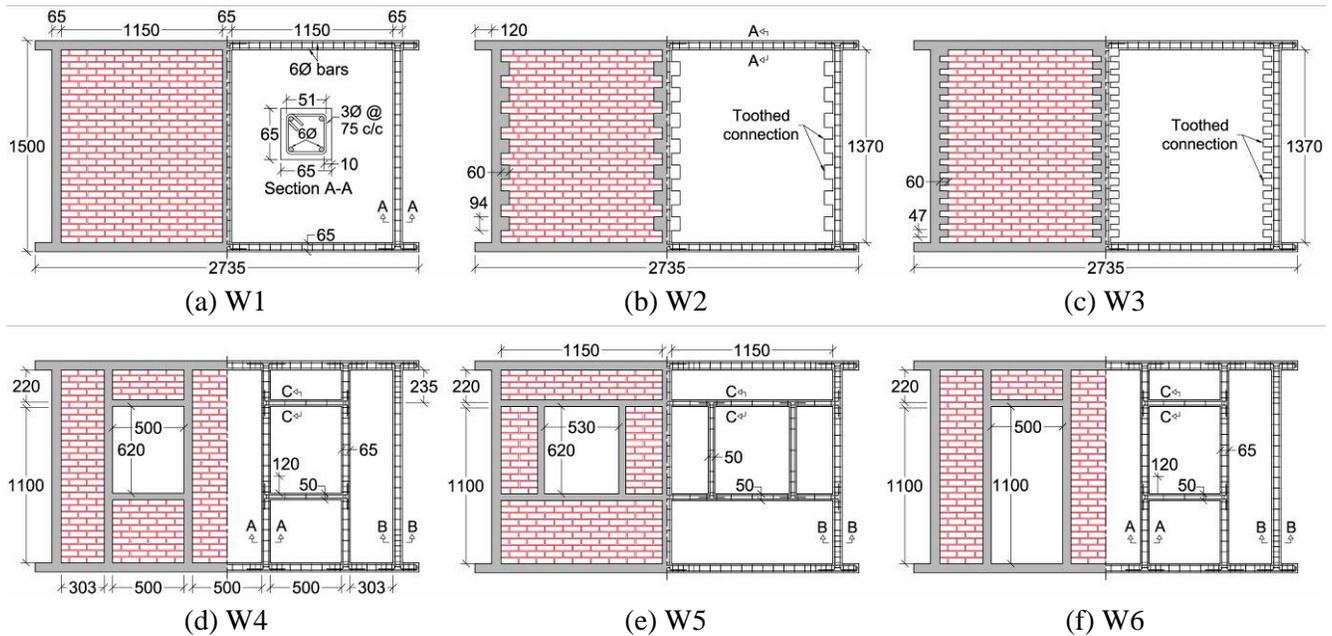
(a) – (f) Details of confined masonry wall specimens
